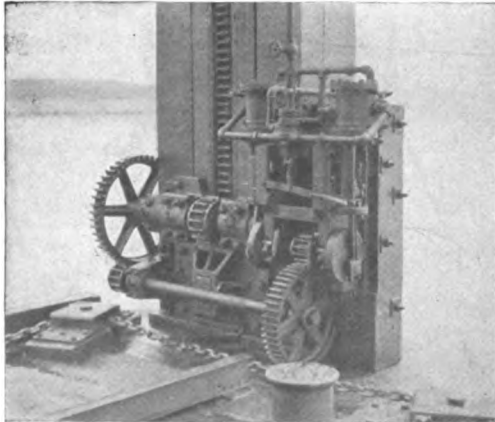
Spud Gear on Drill Boat at West Neebish Channel.
